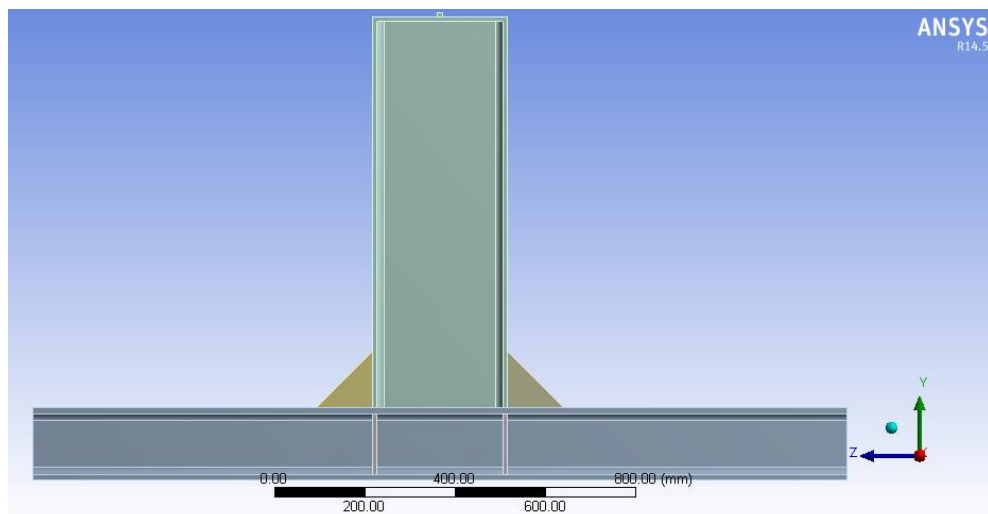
Flange bracing and four column web bracing gussets (improved model)
